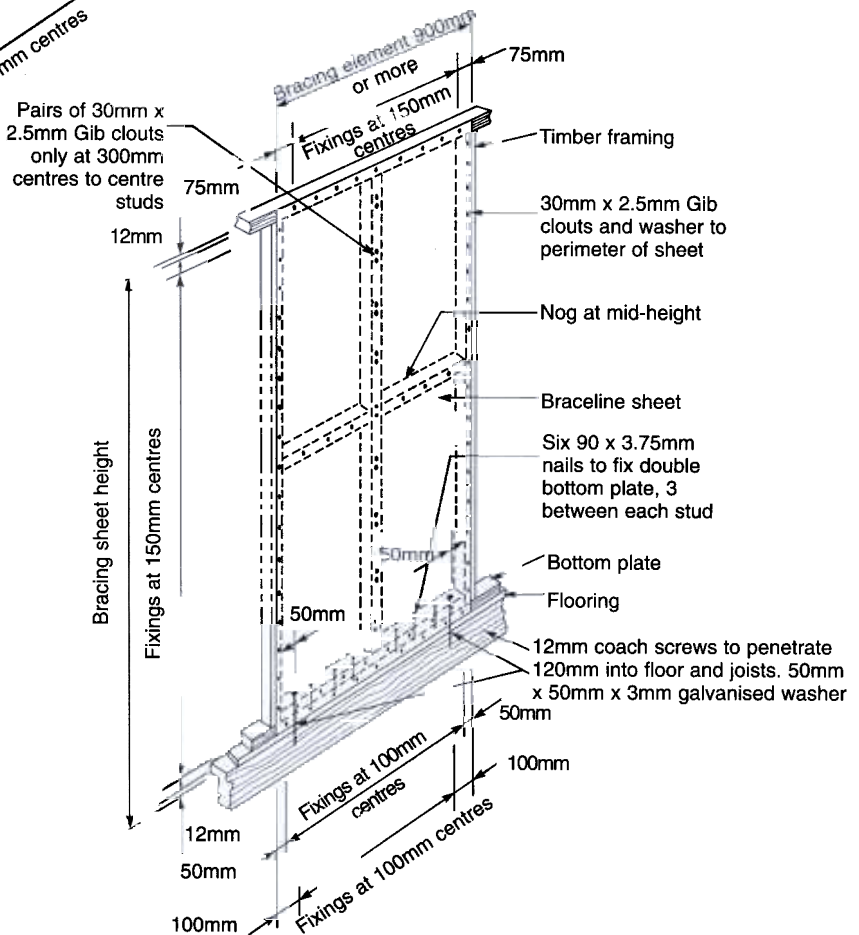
HARDITEX™ / BRACELINE GROUP NAILING DETAIL TO TIMBER JOISTS (System HT11B)
